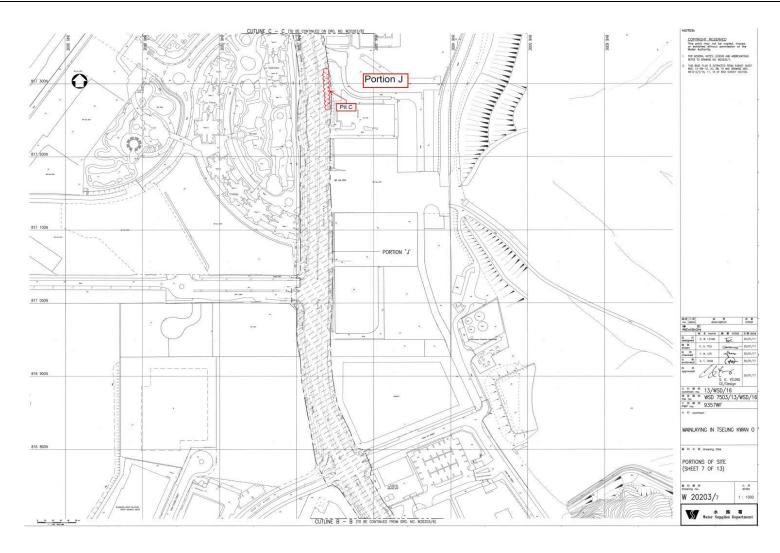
Location Plan for Portion J – CH.A 19+15 to CH.A 19+50 (Pit C)
